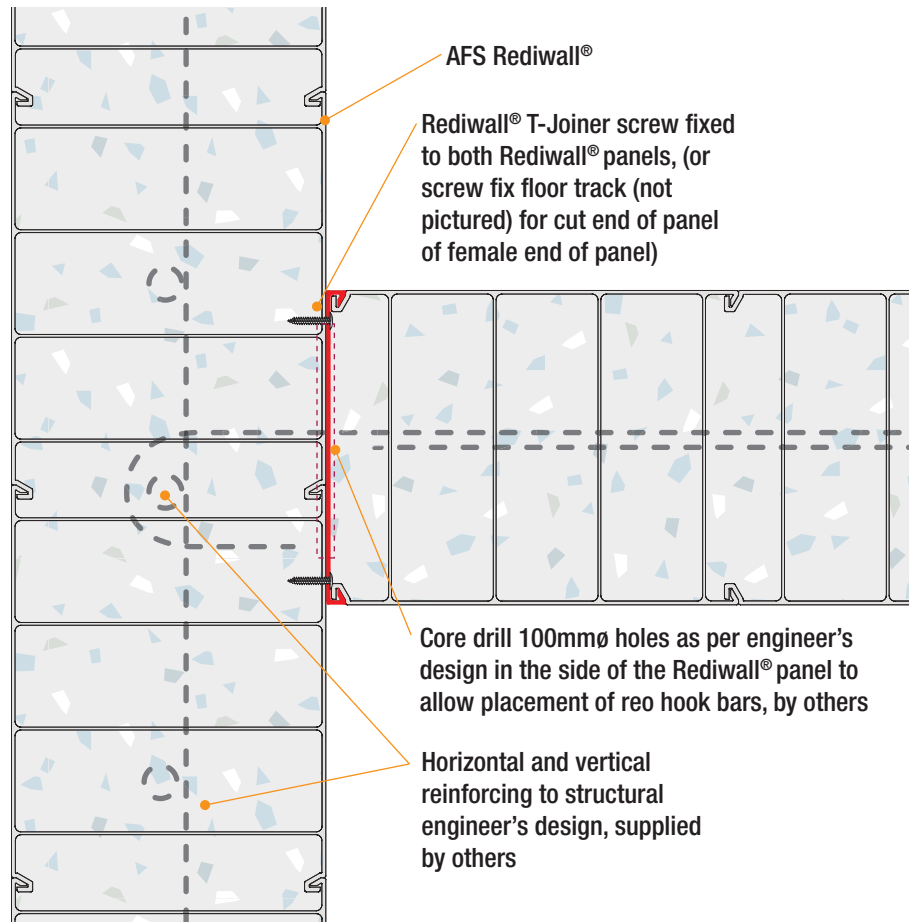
Junction of Rediwall® Party Wall and External Fire Rated Wall
